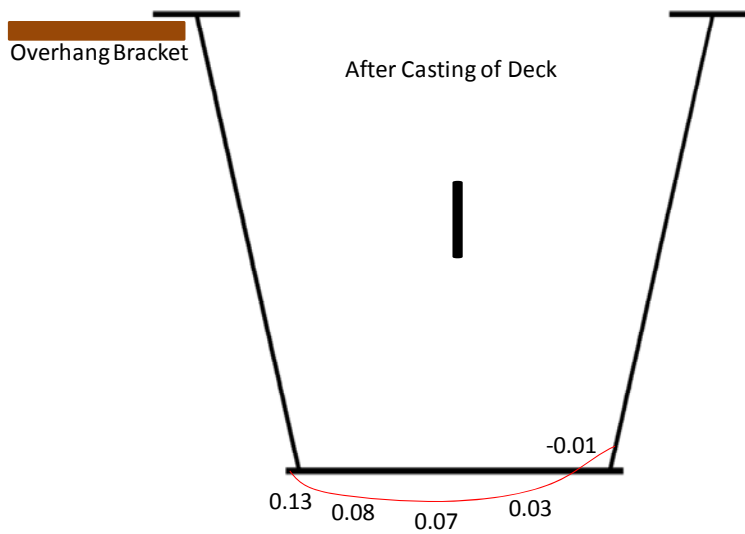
Ext. Girder Bottom Flange Deformations due to Casting of Deck
